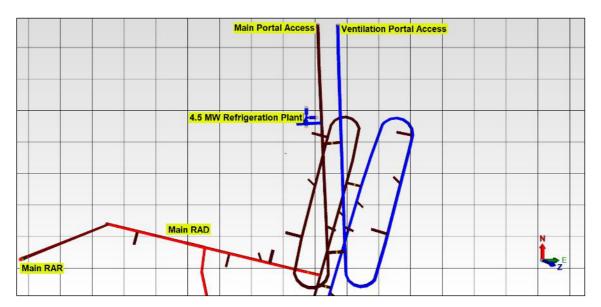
Location of 4.5 MW BAC Refrigeration Plant - Plan View
